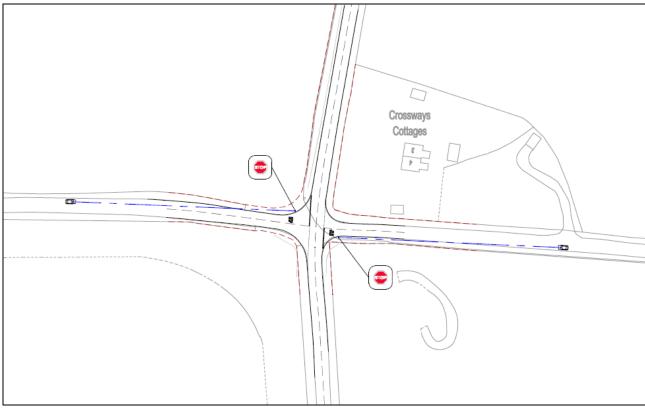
Proposed modified junction layout AECOM drawing 60445024-SKE-C-008-A
